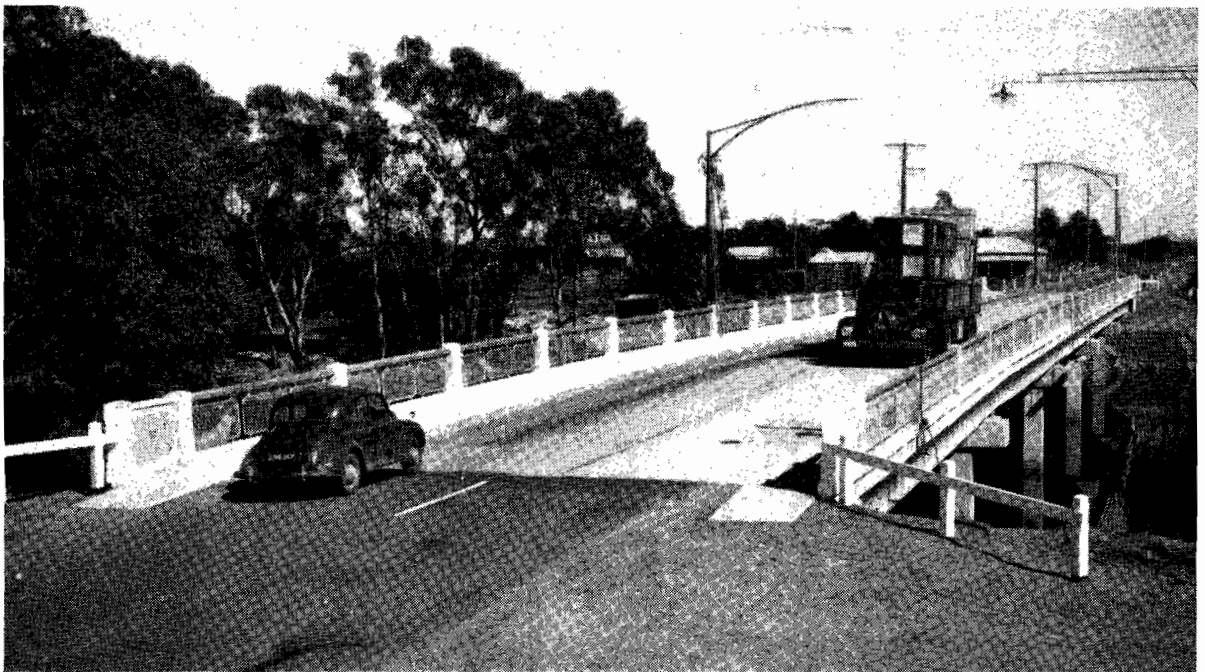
Calder Highway. New bridge over the Loddon River at Bridgewater.
